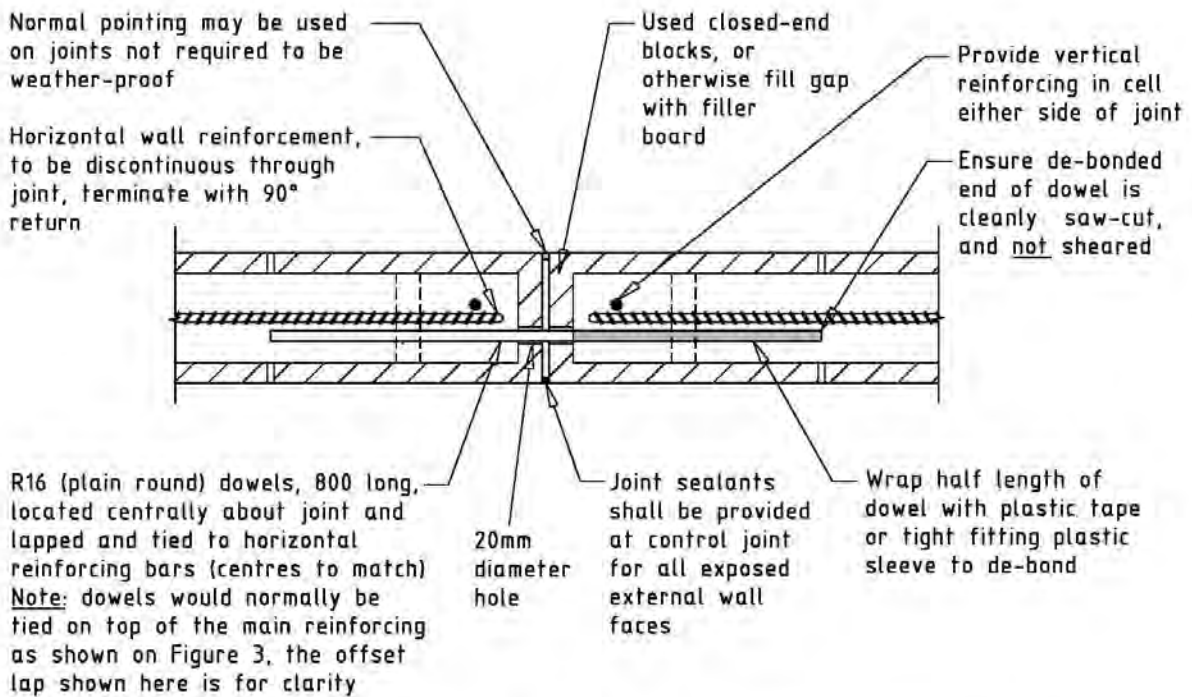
Control joint detail for solid and partial fill walls (does not apply to bond beam and lintel reinforcing)
